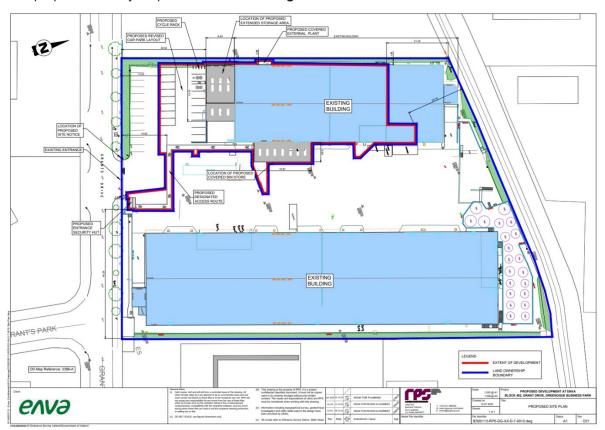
Proposed Site Layout Plan at the Enva Facility
